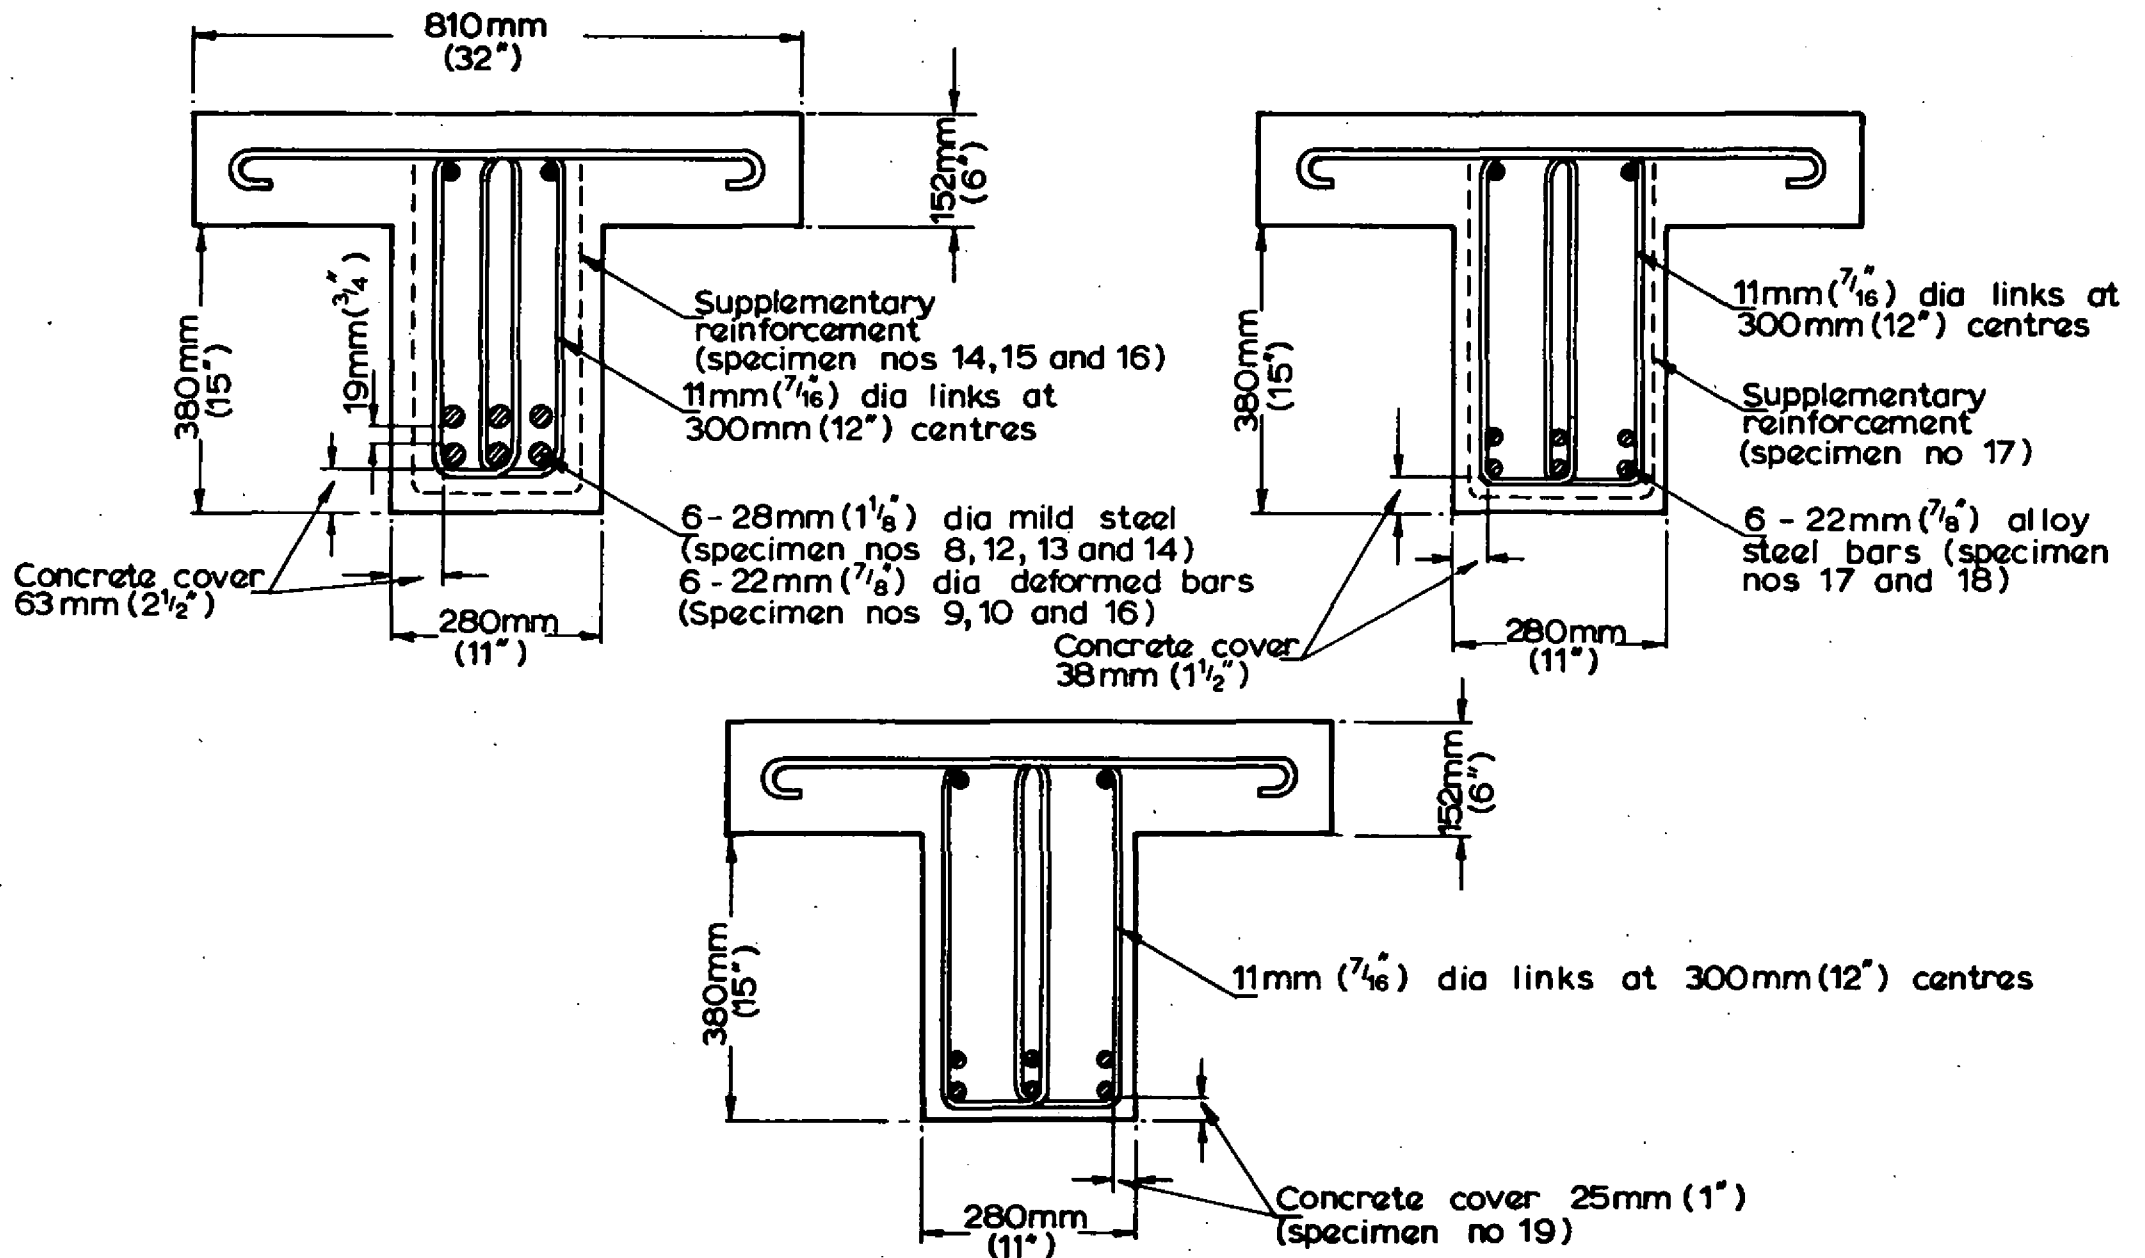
CROSS-SECTION OF REINFORCED CONCRETE BEAMS
